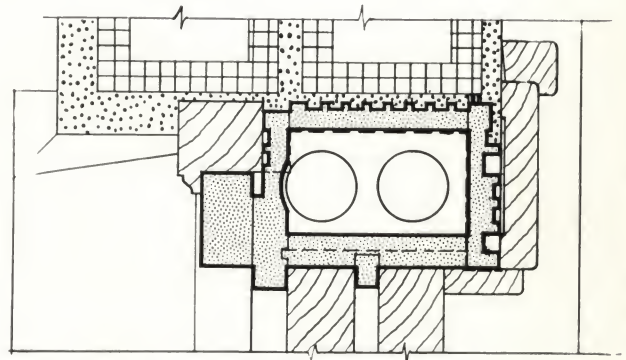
Box frame No. 671 in standard block or tile wall. (Anchor strip omitted.)
